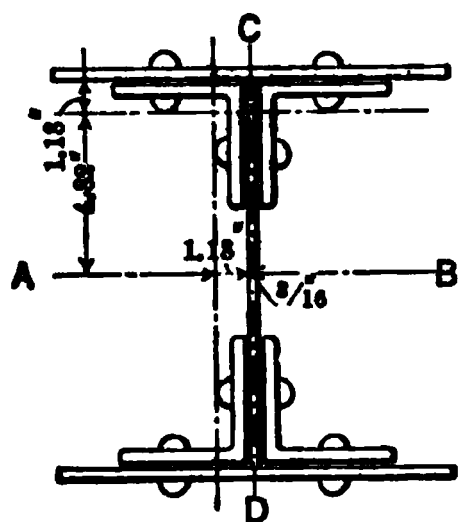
Least Radius of Gyration of Cross-section of Plate-and-angle Column
